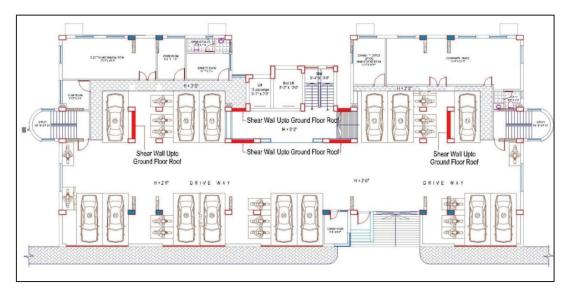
Provision for Column Connecting Shear Wall up-to Ground Floor Roof for Soft Storey Improvement
